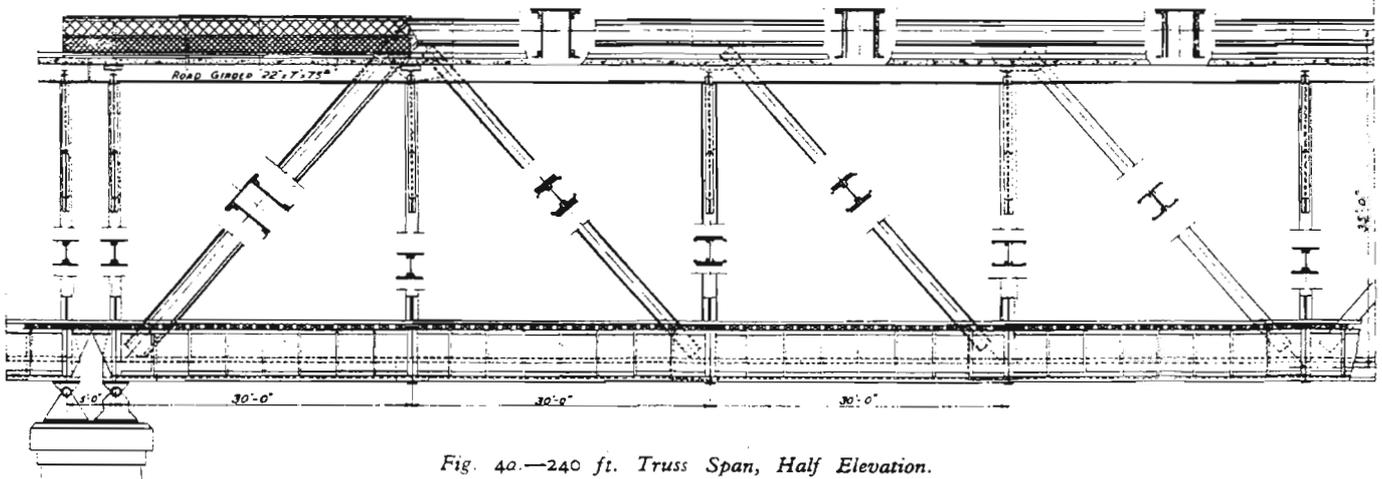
240 ft. Truss Span, Half Elevation.
